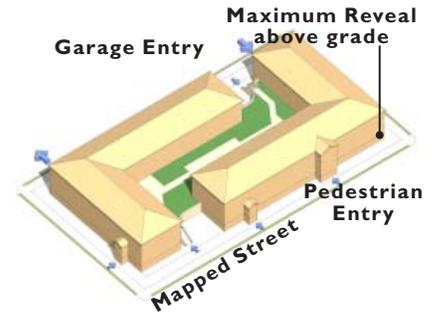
Basement or Podium parking provides a hidden or minimally revealed plinth on top or next to which building types locate facing the street. Terraces or conditioned space sit atop the podium structure.
